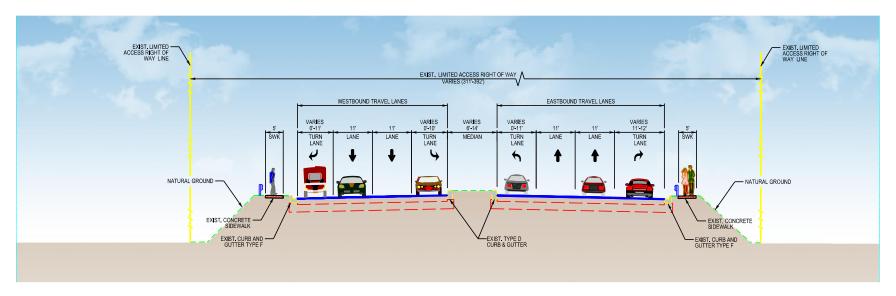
Typical Section - Lantana Road from Sunset Road to SR 9/I-95
